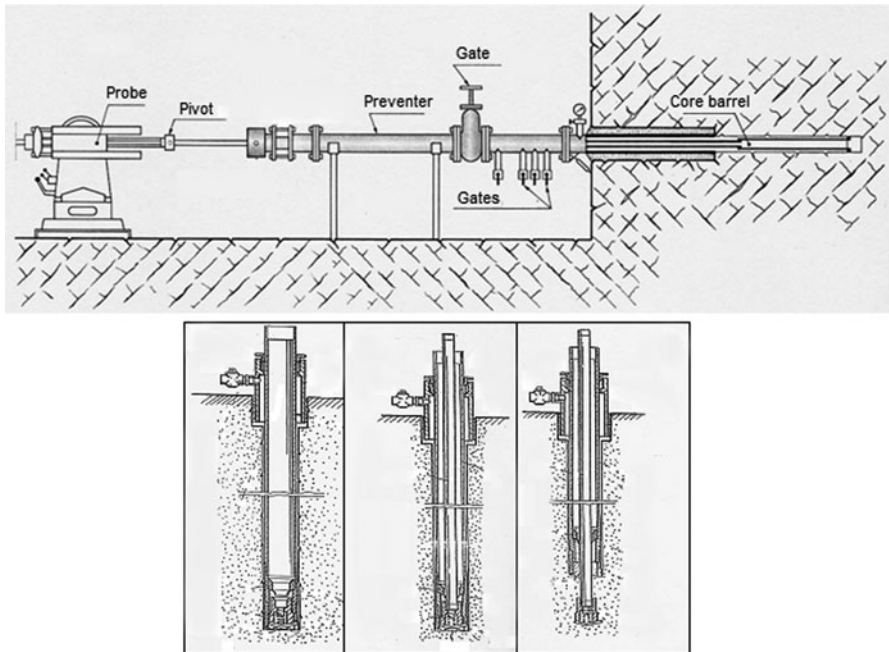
Drainage installation system with pipe, sleeve and preventer
